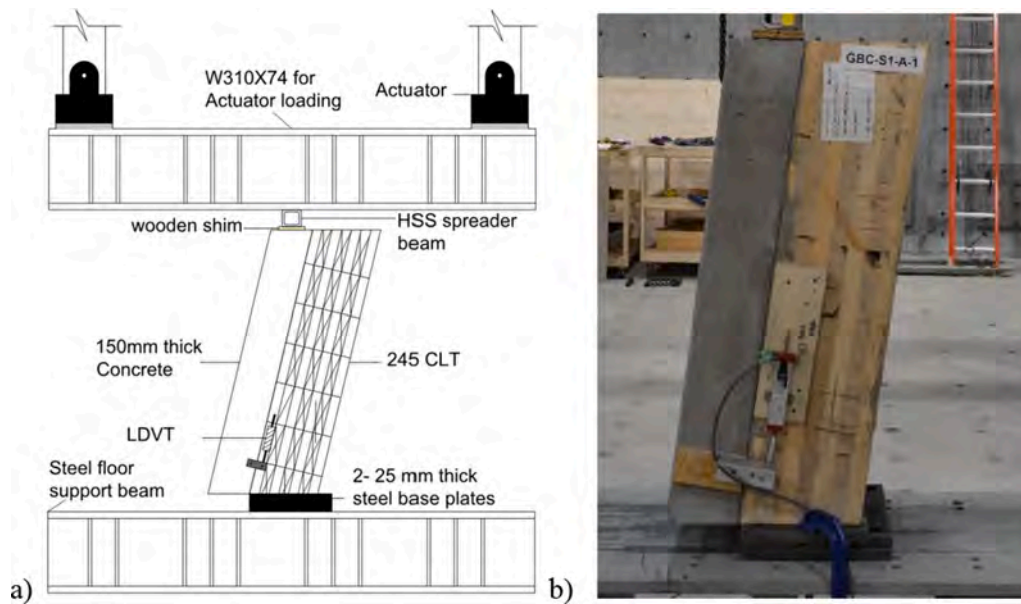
(a) Schematic of small-scale test setup, and (b) photo of a test setup.
